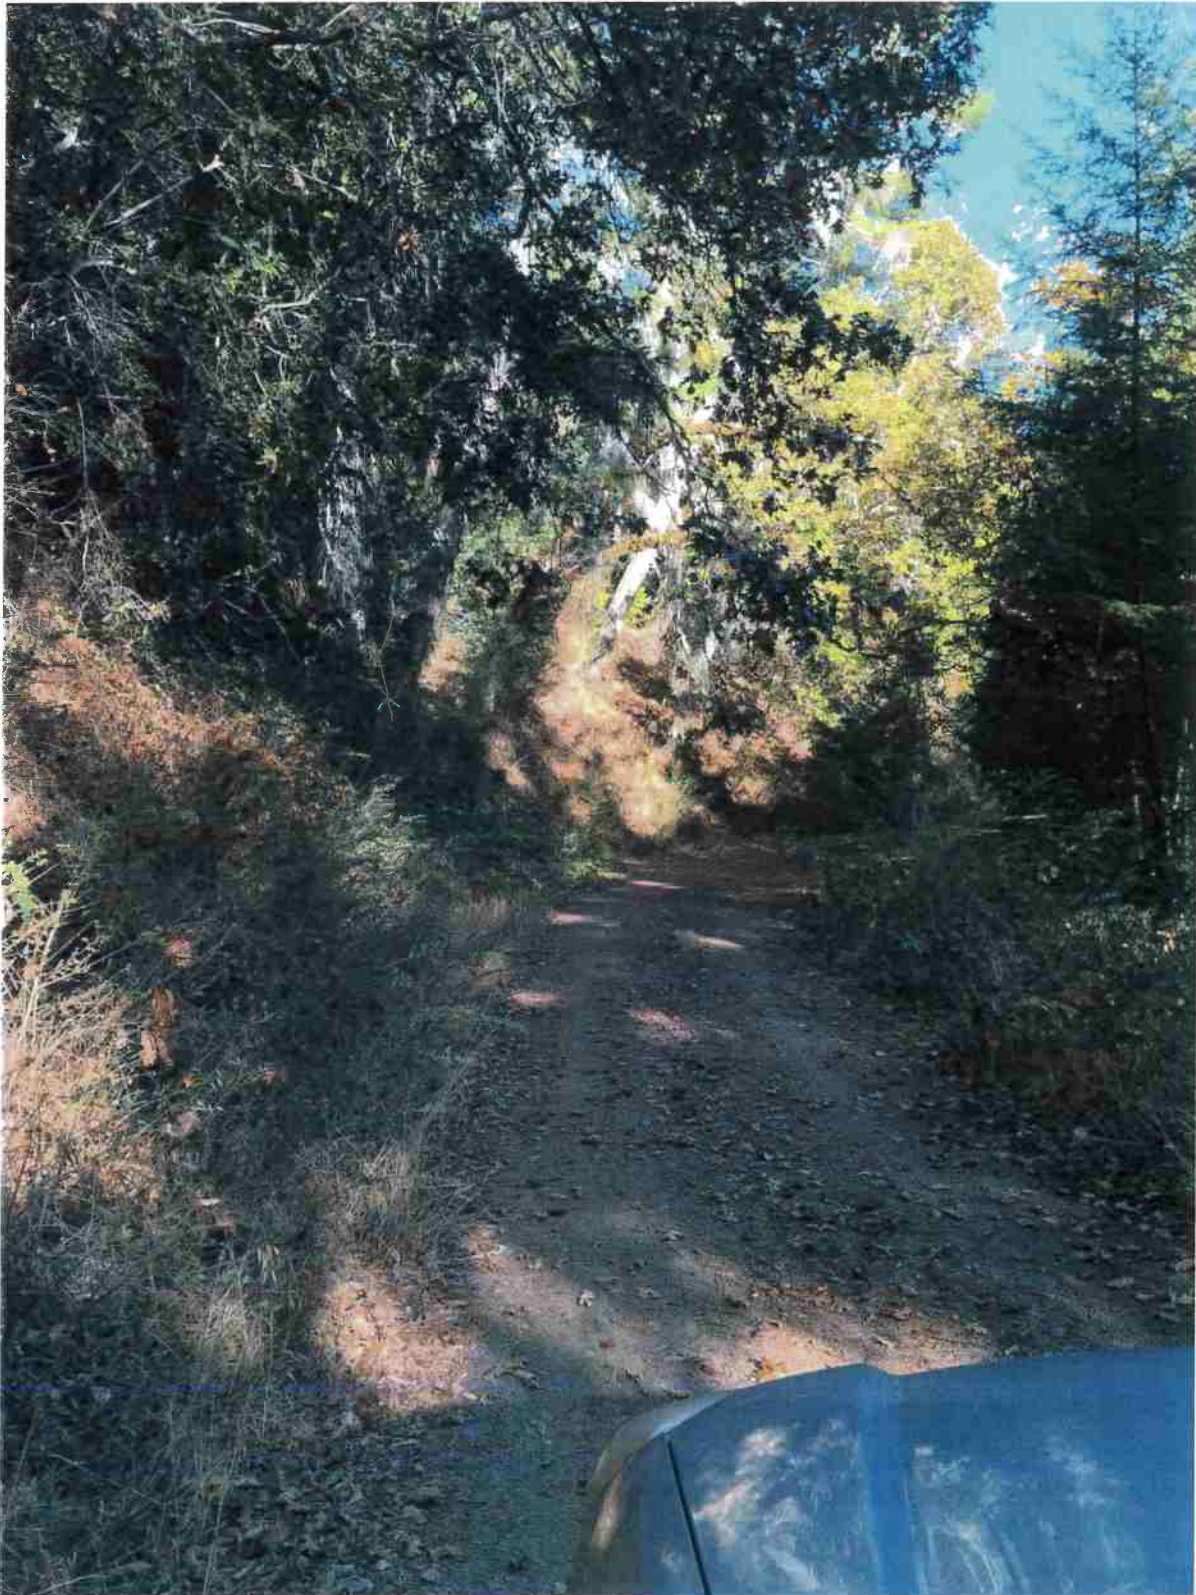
10'-wide travel way, no shoulder, gravel surface, no inter-visible turn outs.
